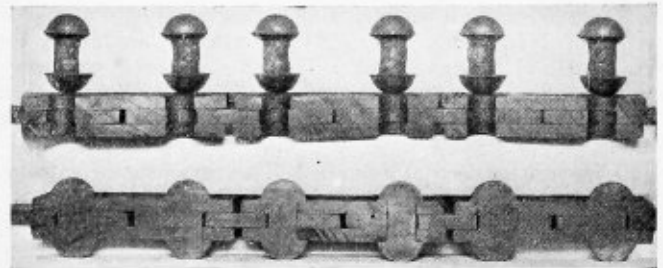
Sectional Views of Riveted Joint After Failure
